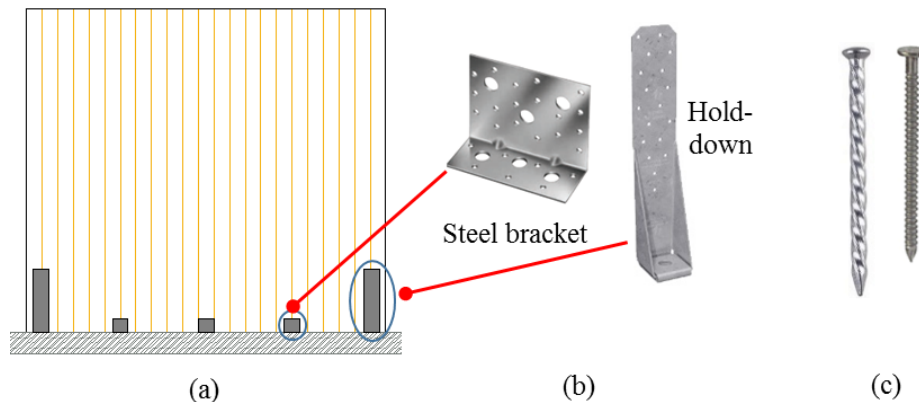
(a) Schematic of CLT shear wall, (b) steel bracket and hold-down, and (c) fasteners
